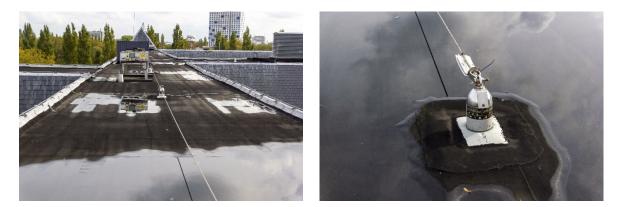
(left): Building 8, flat roof [photo: Michiel Fremouw] Figure 24 (right): Building 8, fall prevention wire [photo: Michiel Fremouw]
